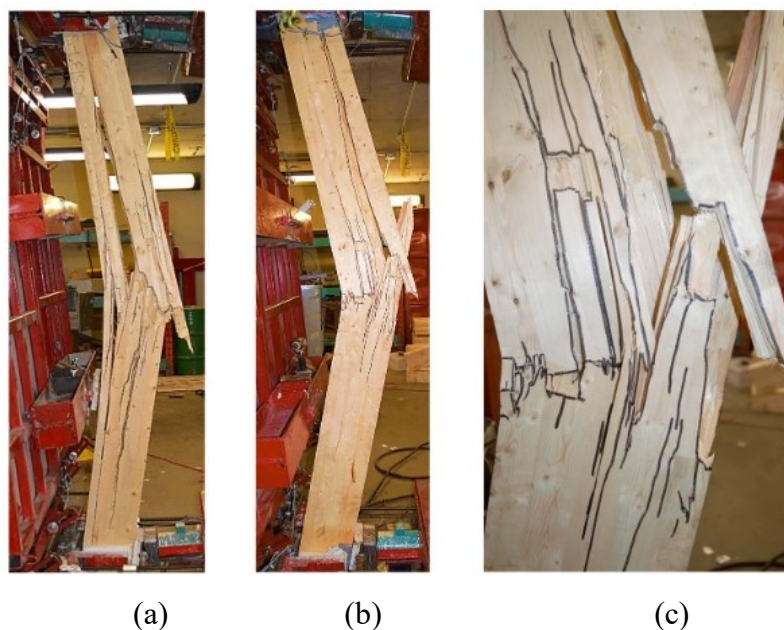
Failure modes in glulam elements: (a) Beam (b) Column (c) Column midspan damage (D. Lacroix & Doudak, 2018)
